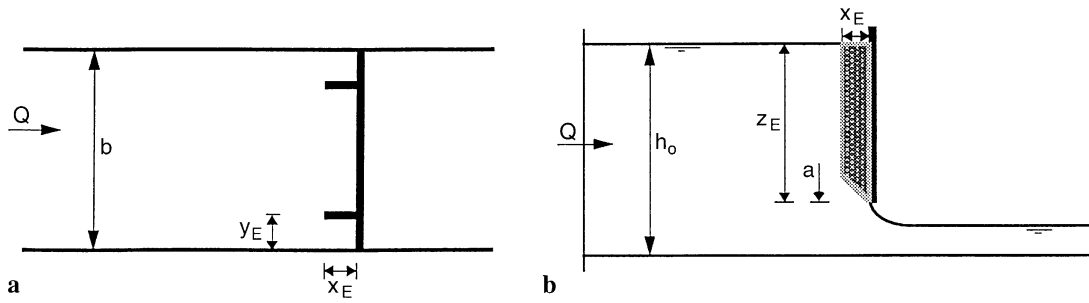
, b. Anti-vortex element. a Plan, b side view
